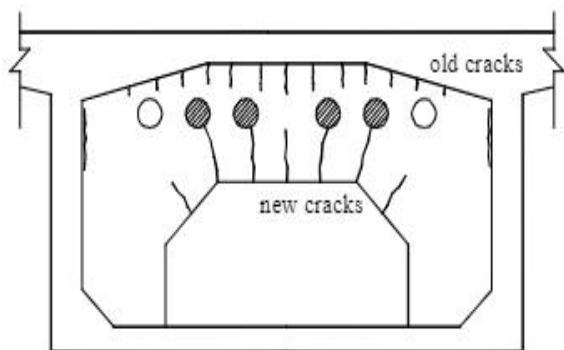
Box girder strengthening by using external prestressing tendons [41]
